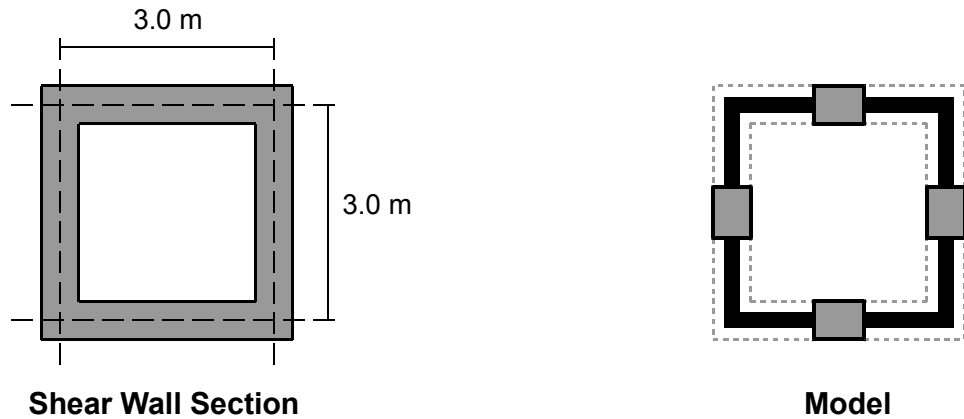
Plan of a Square Shear Wall Assembly and Its Proposed Model
